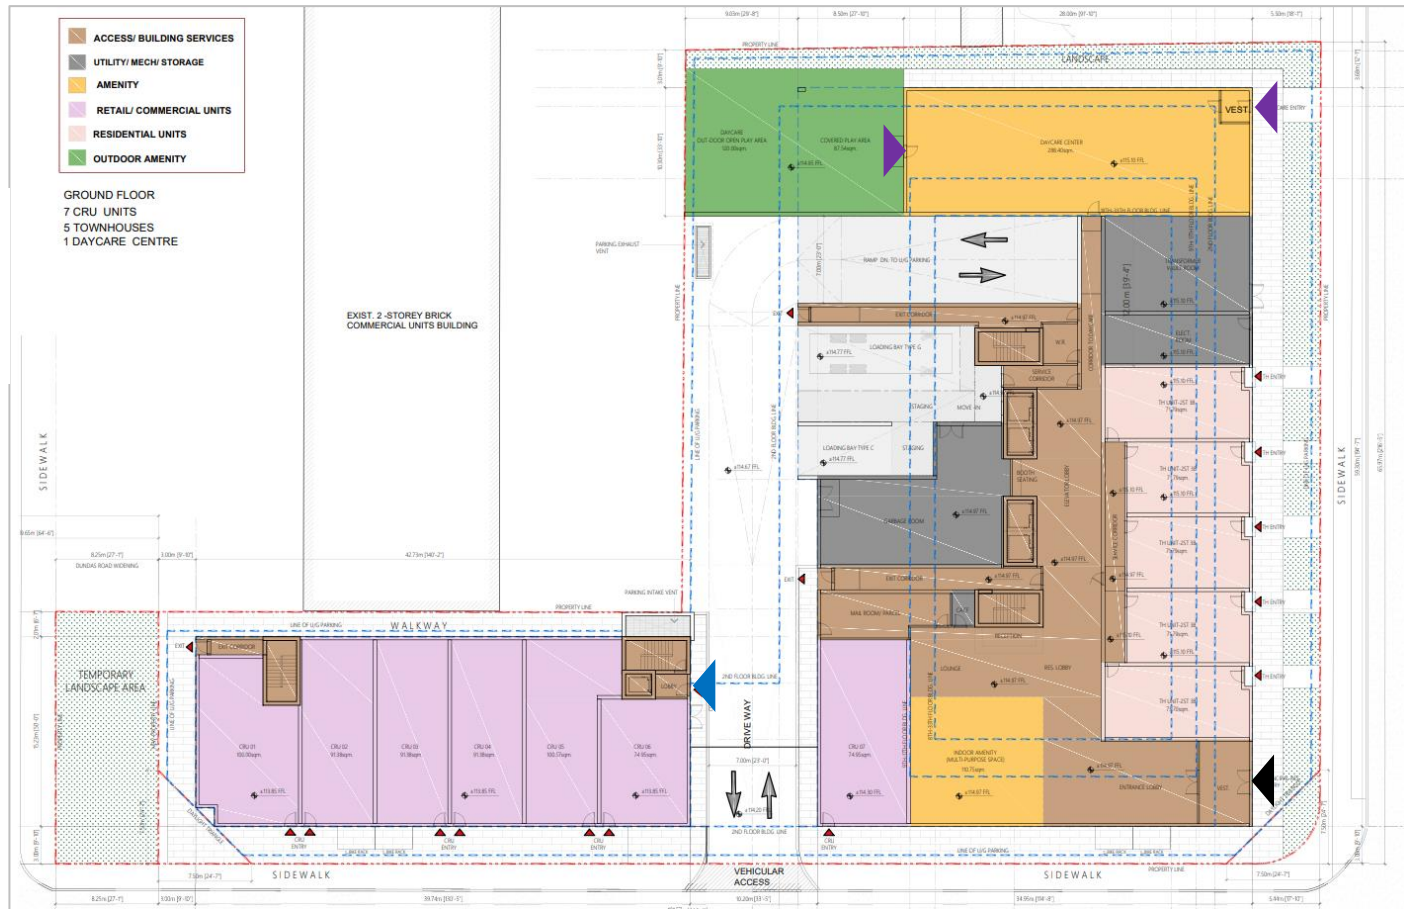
Ground Floor Plan of the Proposed Project (Courtesy of Sajecki Planning Inc.)
